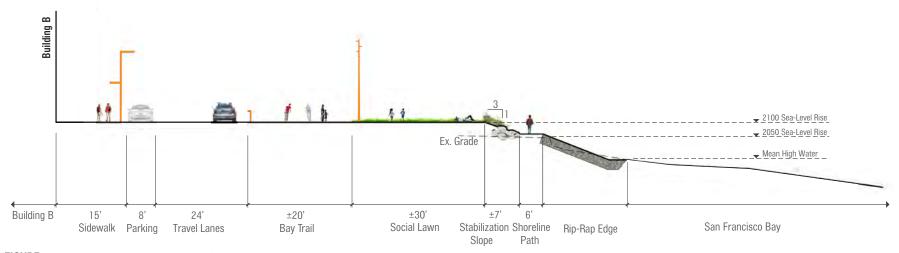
Illustrative Waterfront Terrace Section B-B
